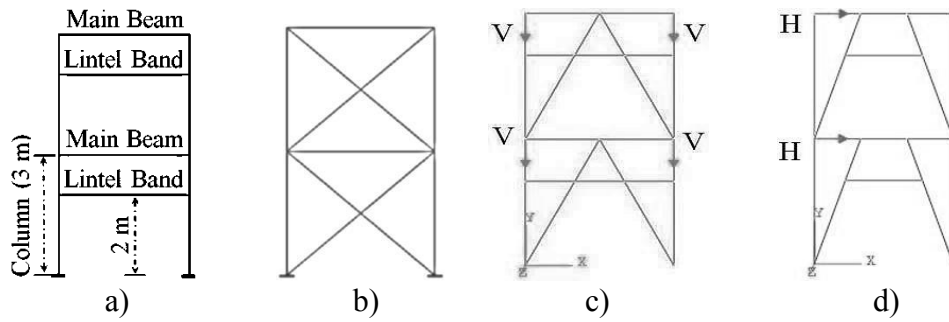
a) One bay two storied frame with lintel bands, b) X bracing, c) Vertical loading in chevron braced frame with lintel bands and d) Lateral loading in eccentric chevron braced frame with lintel
